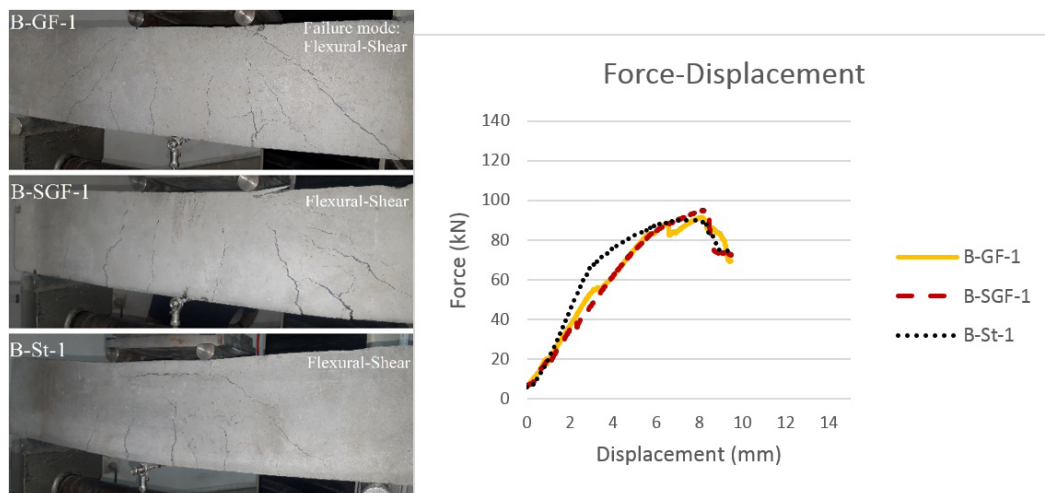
Beams reinforced with GFRP, SGFRP, and steel rebars with reference concrete under bending test.
